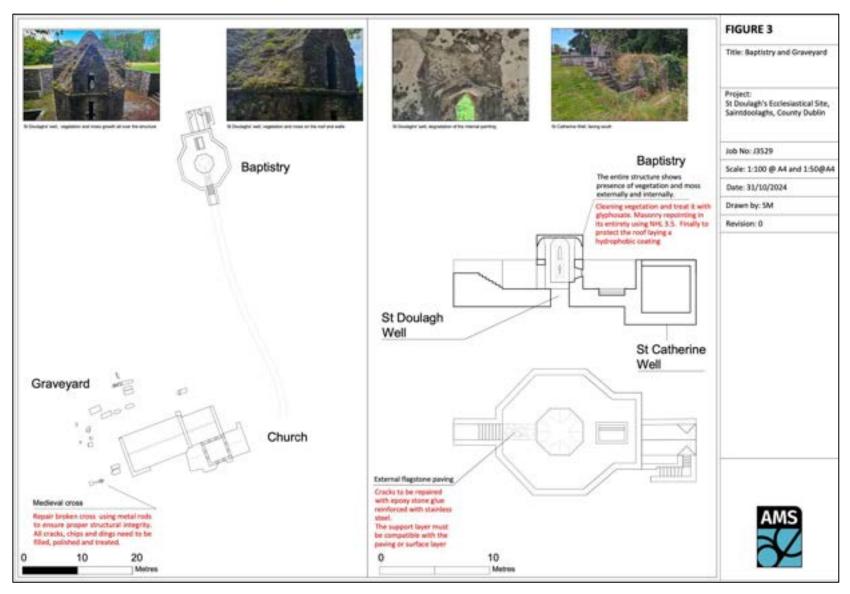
Ground plans of the graveyard, Baptistry and St Catherine's Well.
